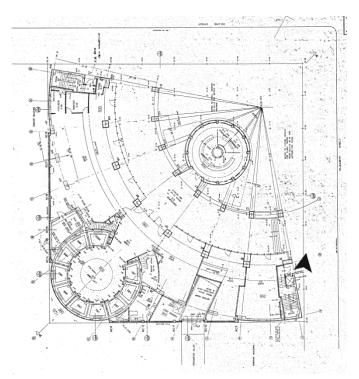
Ground floor plan, drawing dated 1969 (BAP).
